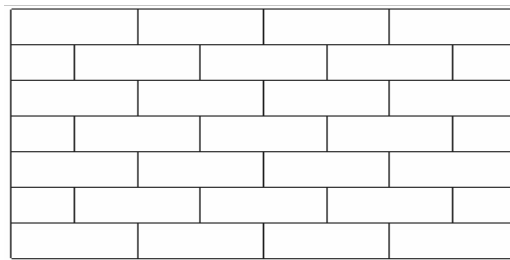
Wood block wall (0.40mx0.08mx0.26m)
